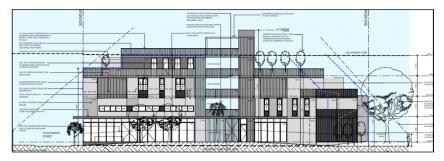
Proposed western elevation, showing the adoption of a stepped built form which assists in minimising the visibility of the upper levels and ensures a transition in scale to the property to the rear (source: Brenchley Architects)
